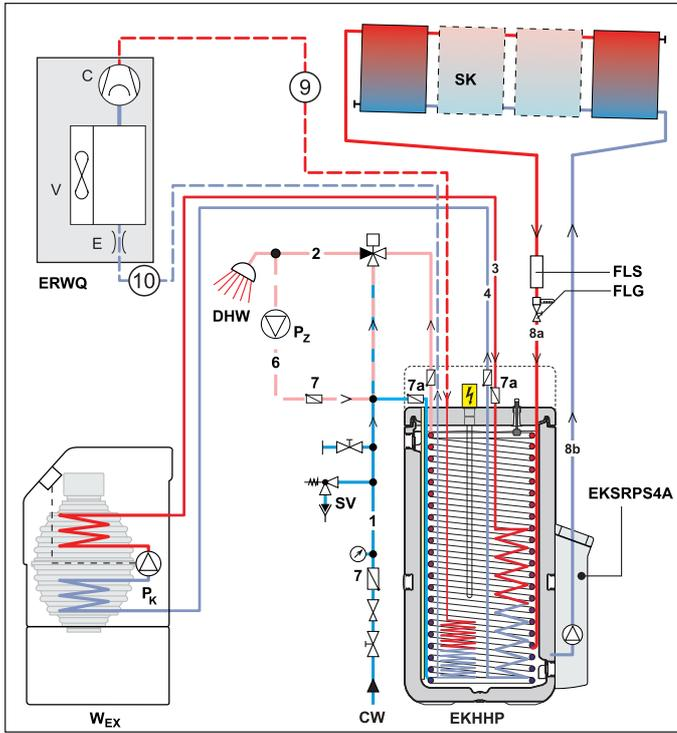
Hydraulic connection - legend see tab. 4-2
